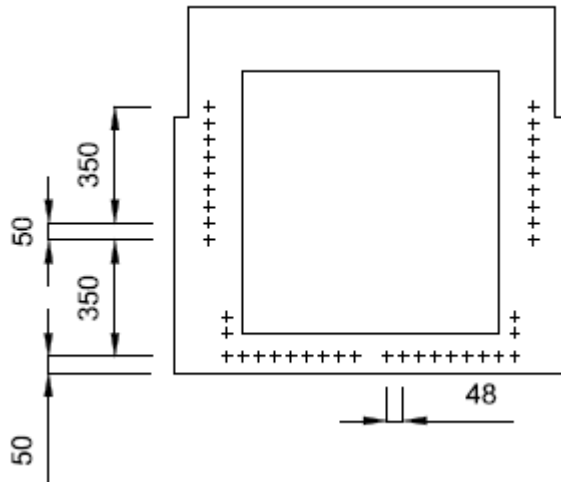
, Prestressing at end cross-section B - dimensions in [mm]
